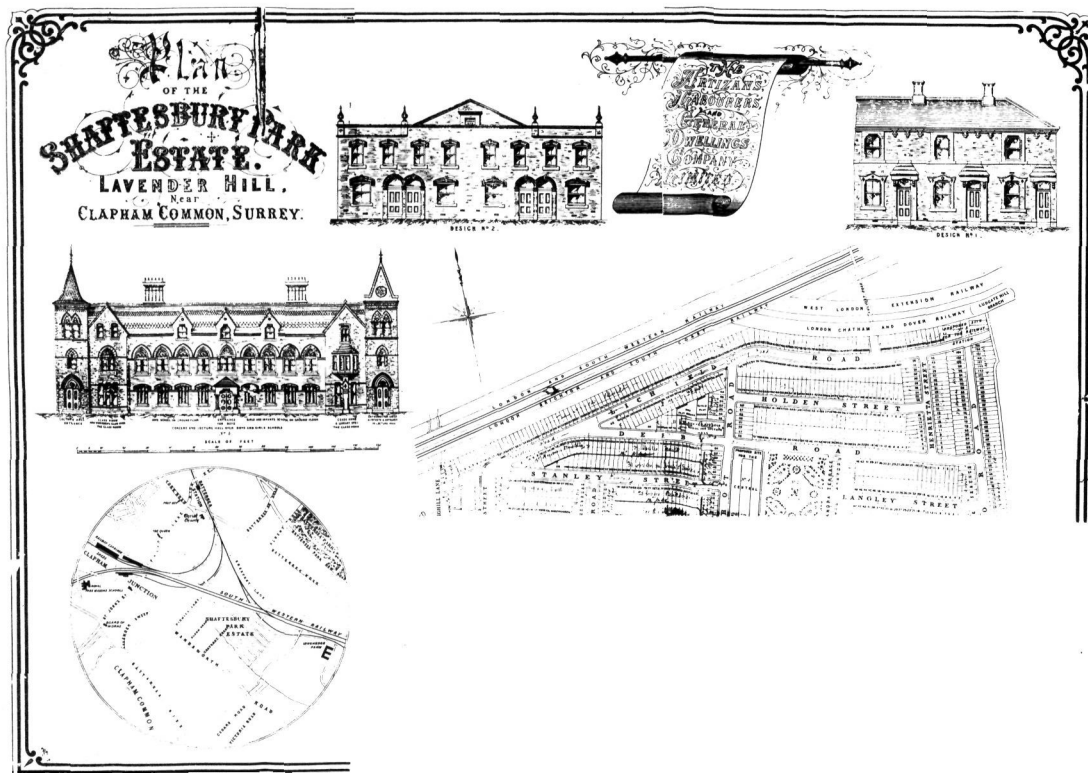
Estate Development: Plans and Elevations for Shaftesbury Park Estate, Artizans, Labourers and General Dwellings Company, 1872.
